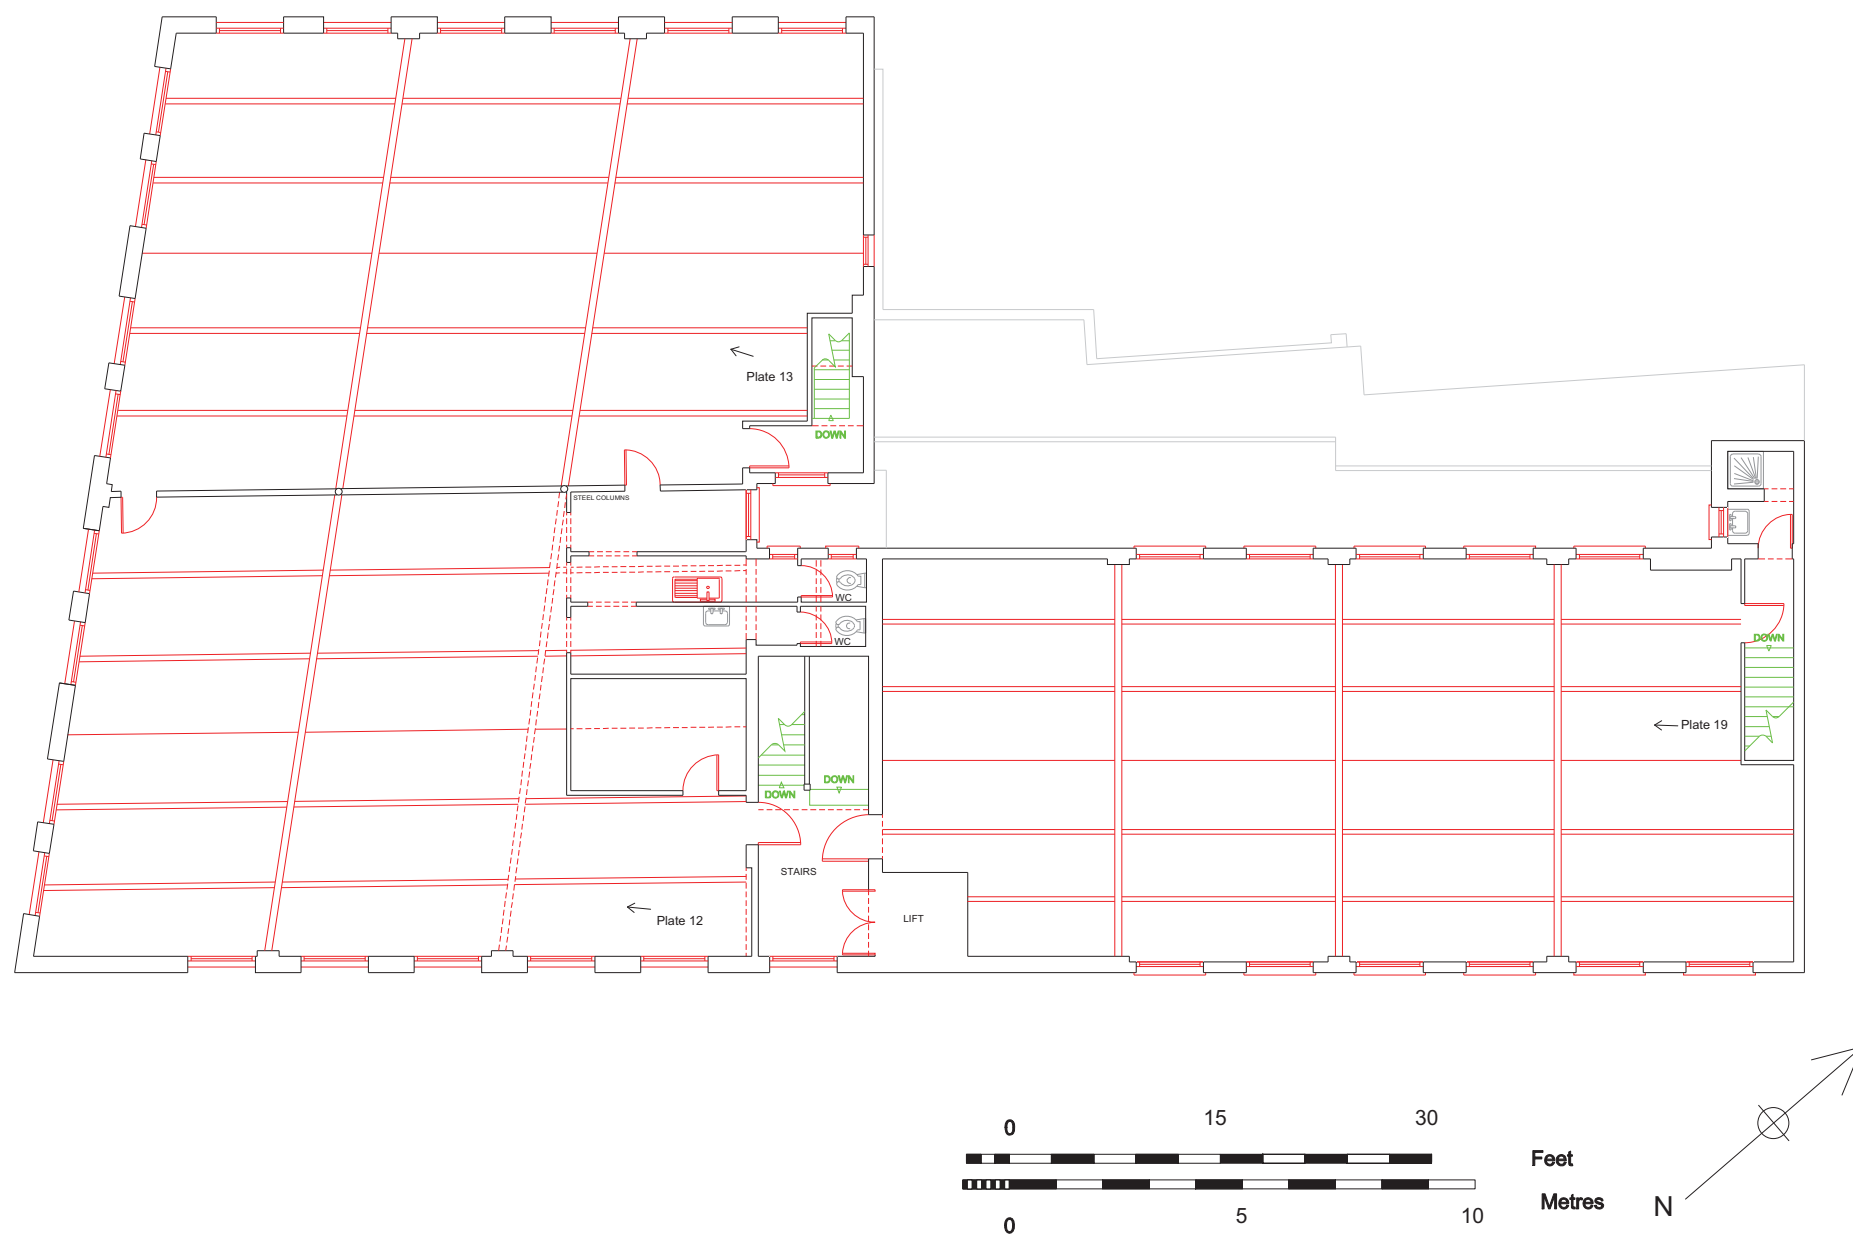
25-27 Bede Street Second Floor Plan with plates located (based upon plans supplied by SV Surveyors Ltd)
